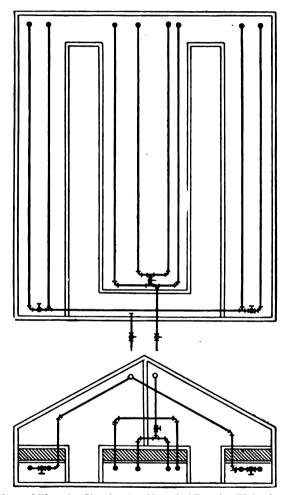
Plan and Elevation Showing One Method of Running Piping in a Greenhouse
